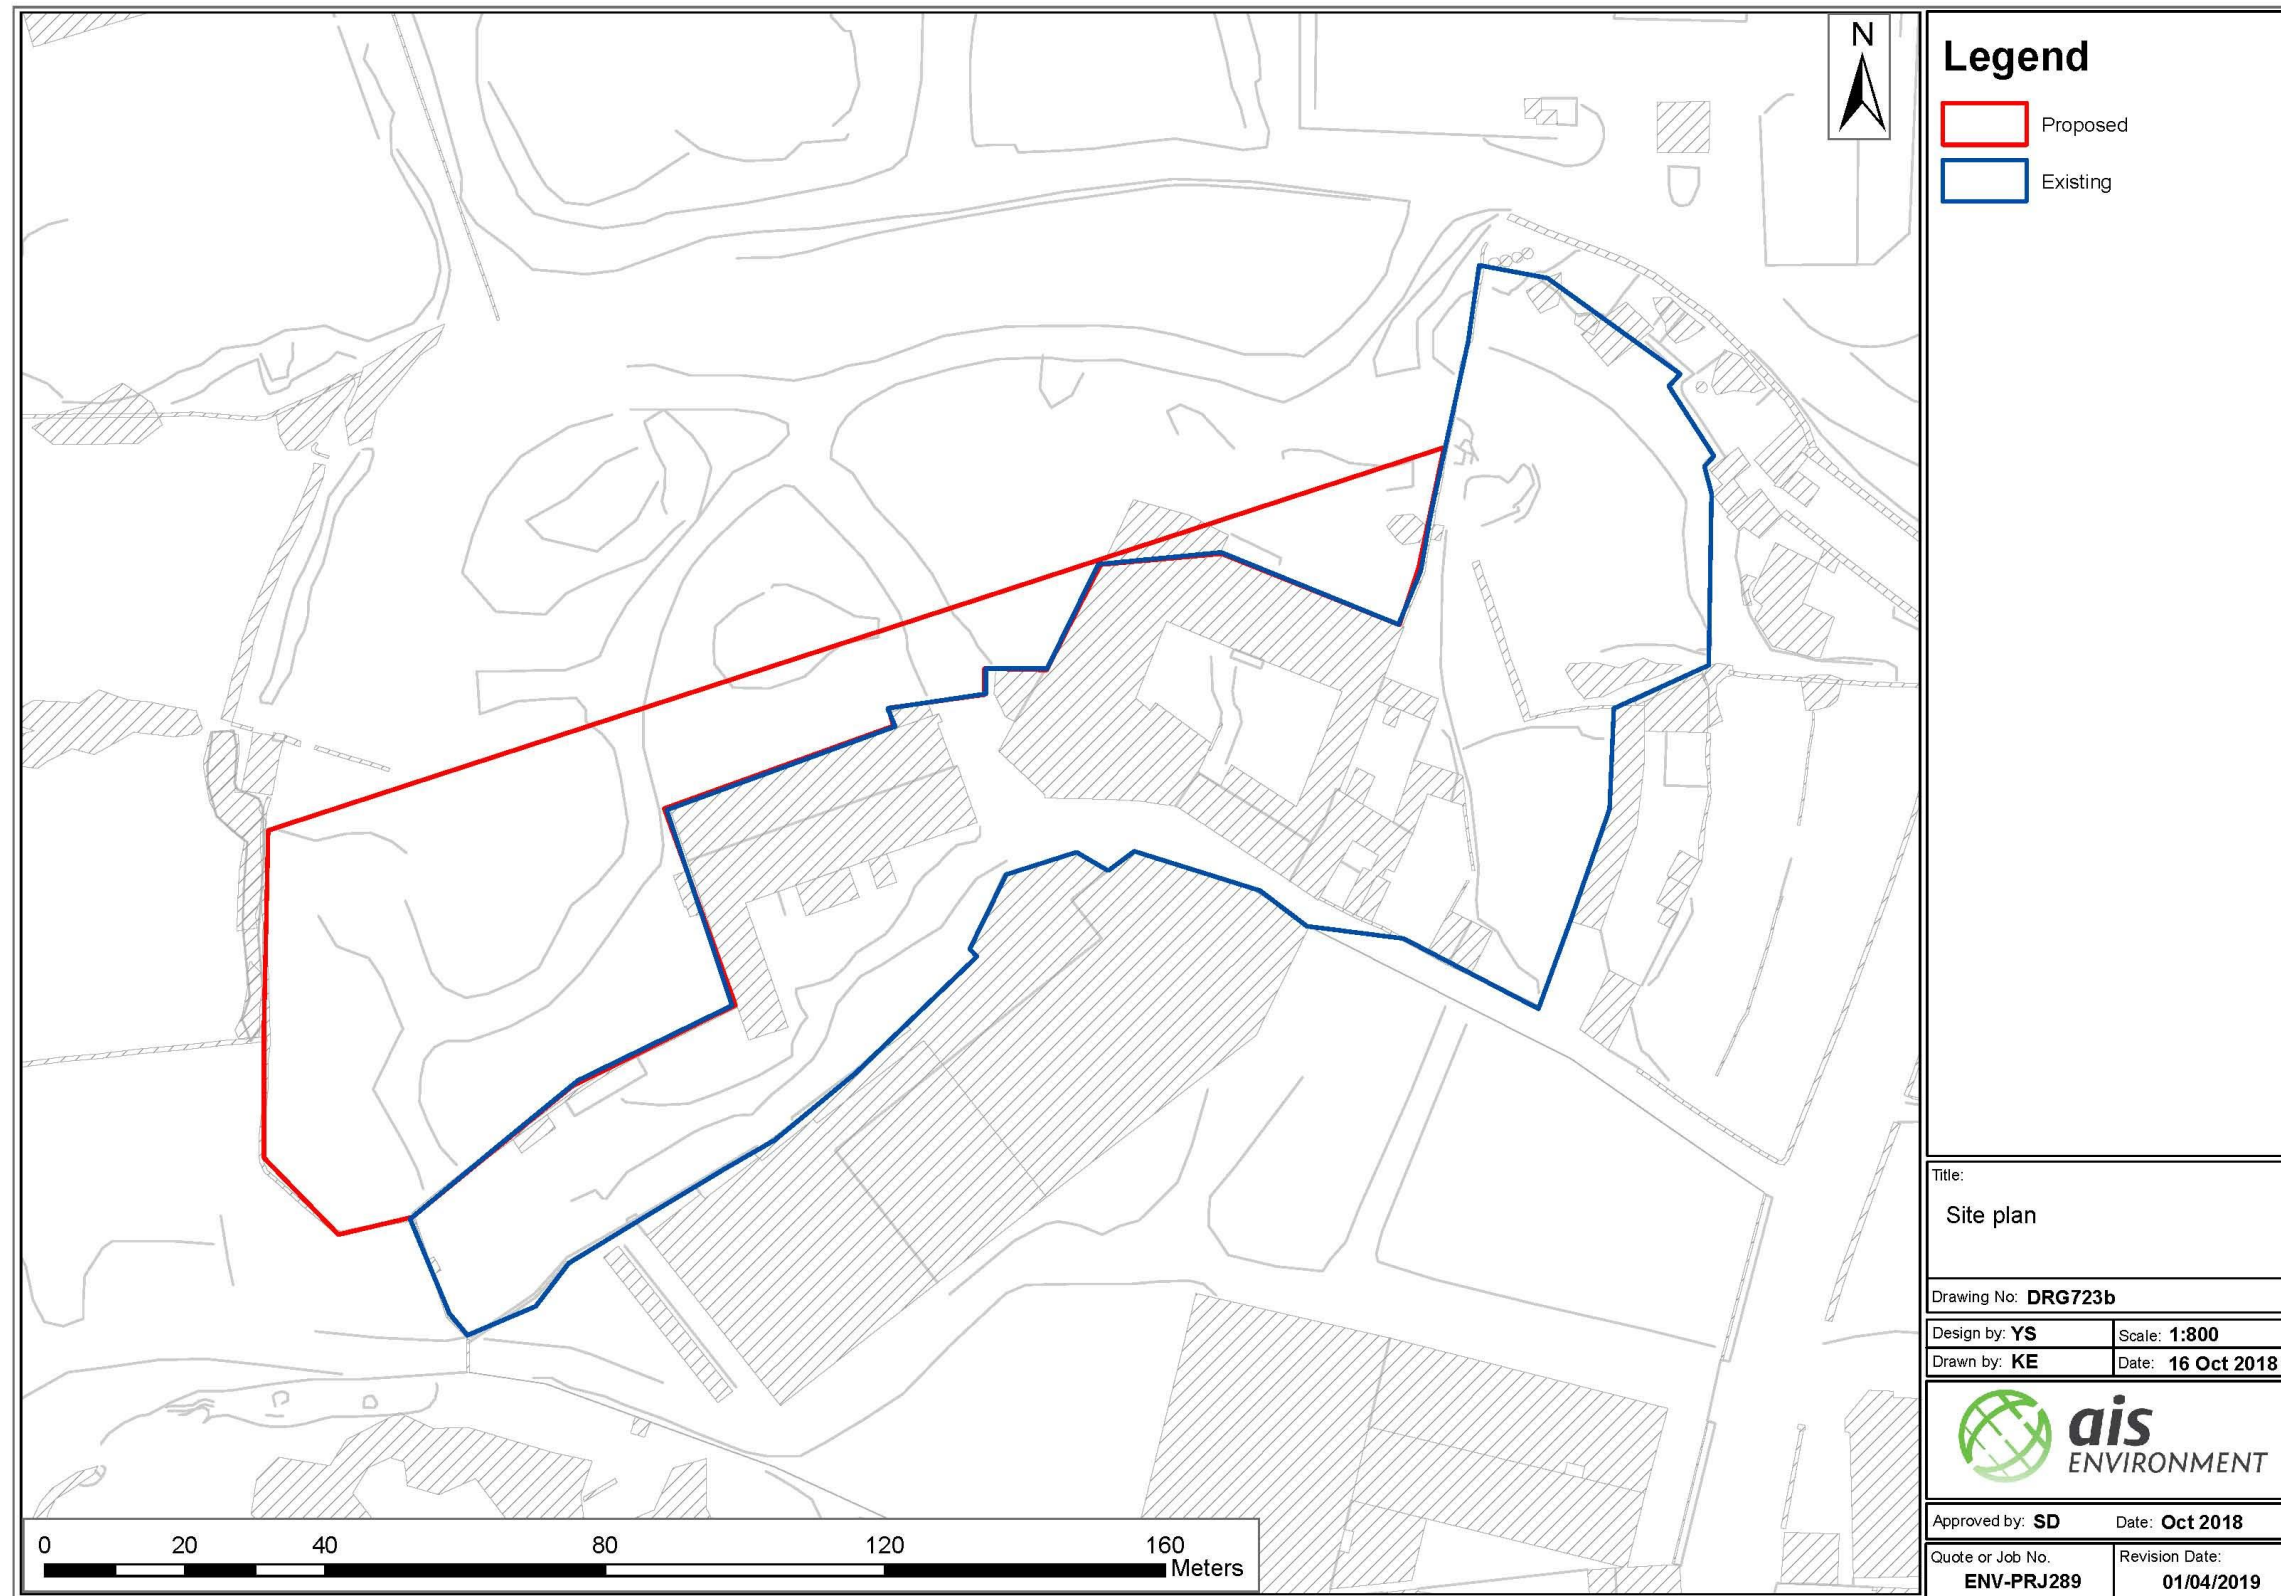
Site plan showing existing site (original IPPC permit) and proposed extension
